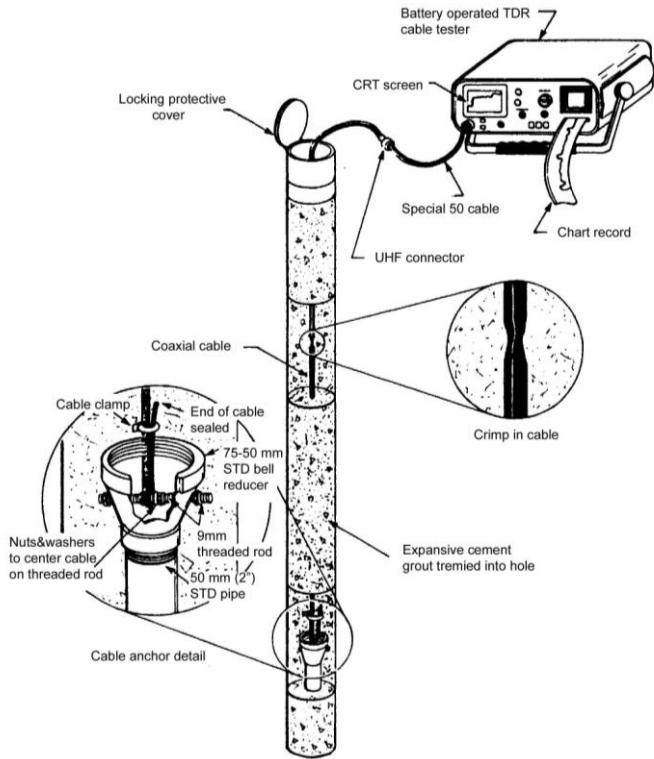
Details of TDR installation (Dowding et al., 1986)
